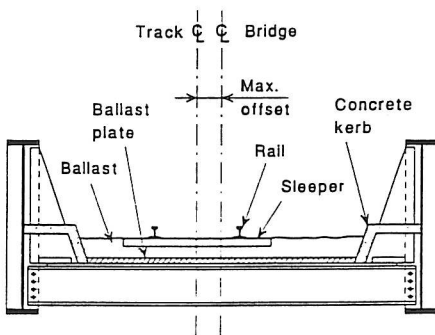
Typical section of a through-girder railroad bridge (curved track)
